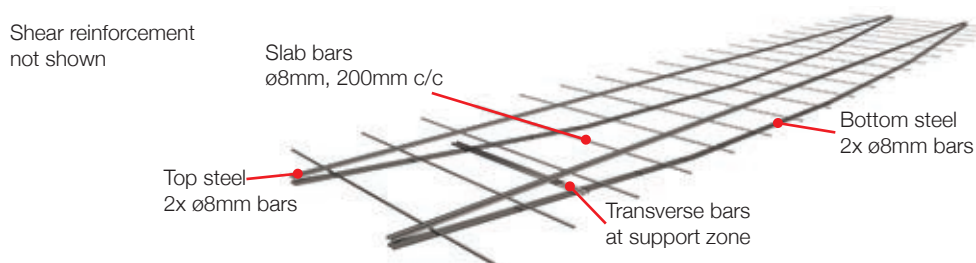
Reinforcement summary, Beams 6\_4\_1 and 6\_4\_2.
